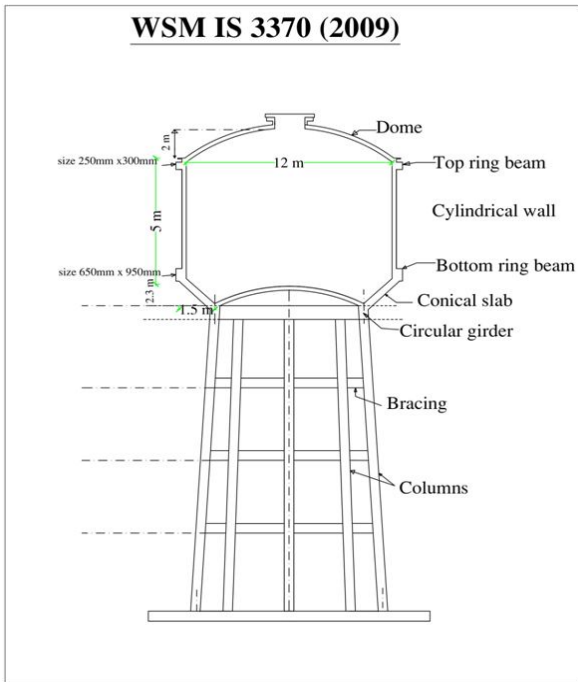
DRAWING SHOWING THE CROSS-SECTION BY WSM IS 3370(1965)
